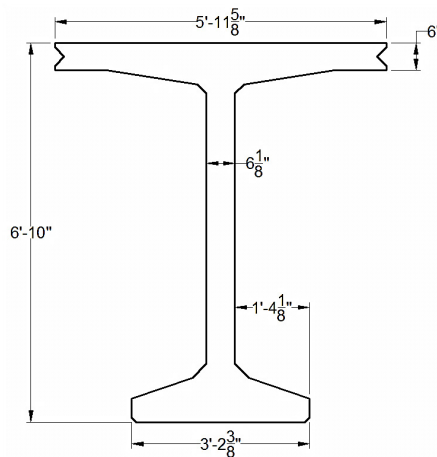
Typical section of a decked bulb-tee girder (Source: PCI 2011)
